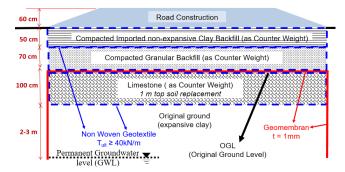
Counter weight and lining system for road foundation sitting on expansive clay.
